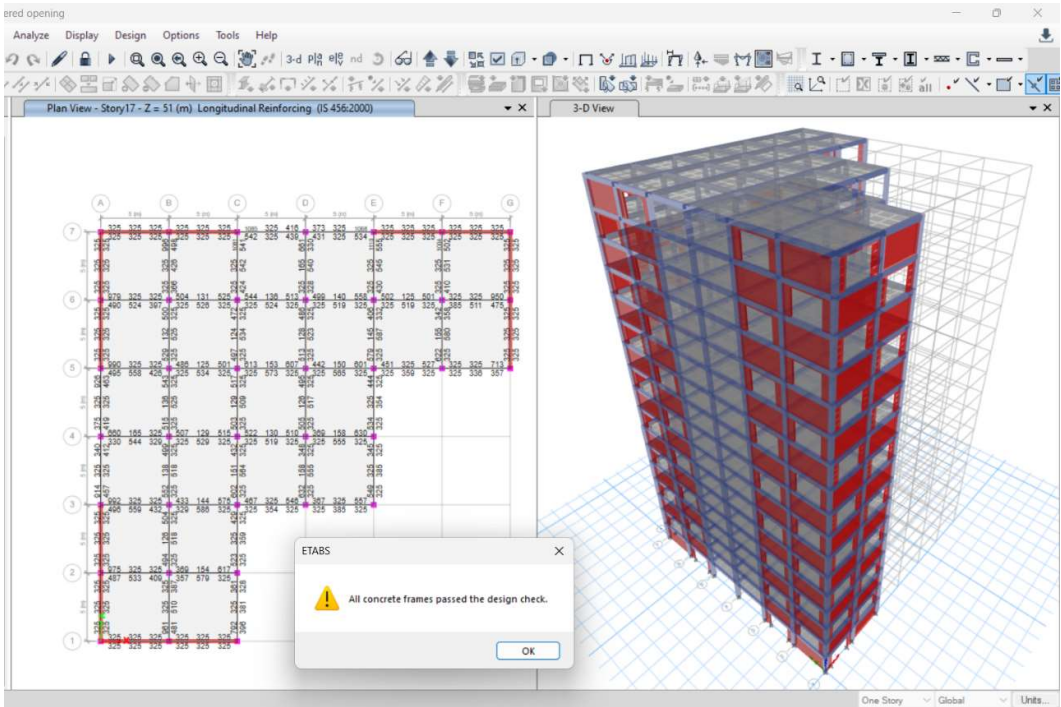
Plan and 3D view of Model MII (HIWSSWO).
